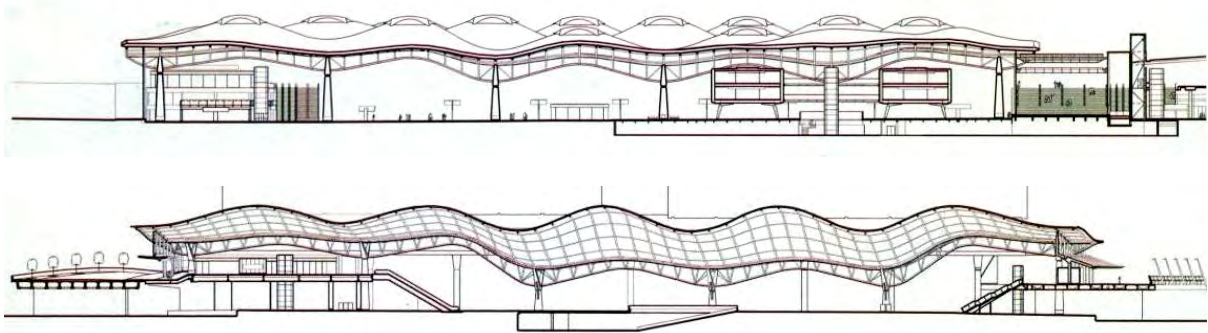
Cross sections through Spencer Street Elevation and north-south section (Roke, 2007: 54)
